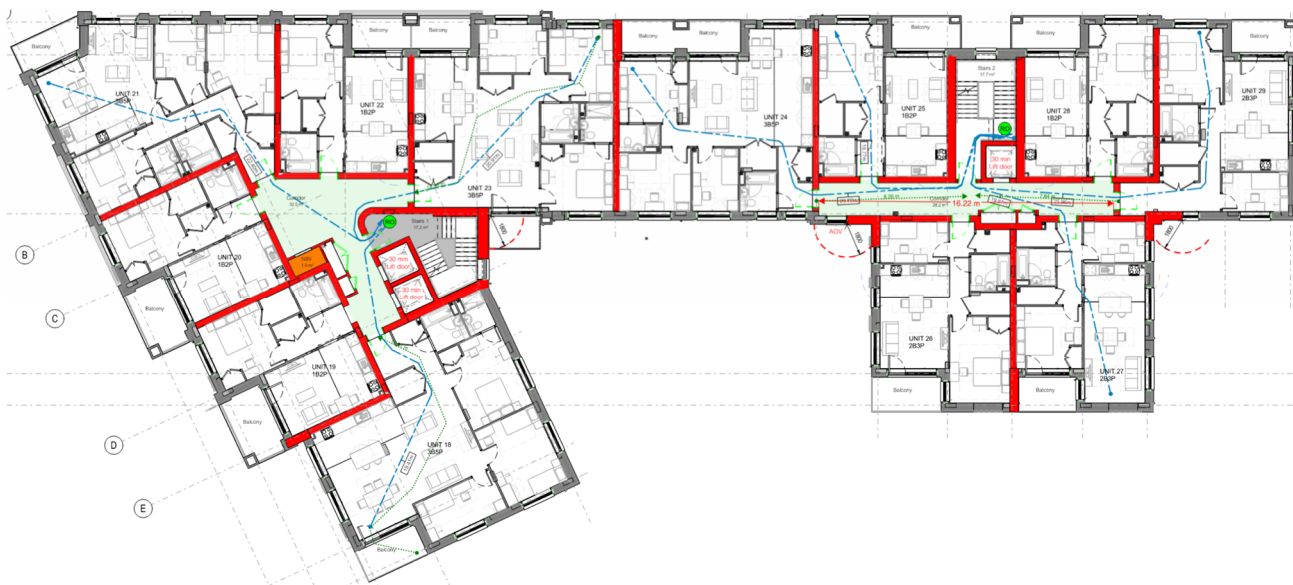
Second floor layout (Dwg No: M9534-HUN-02-02-DR-A-05-4002).
